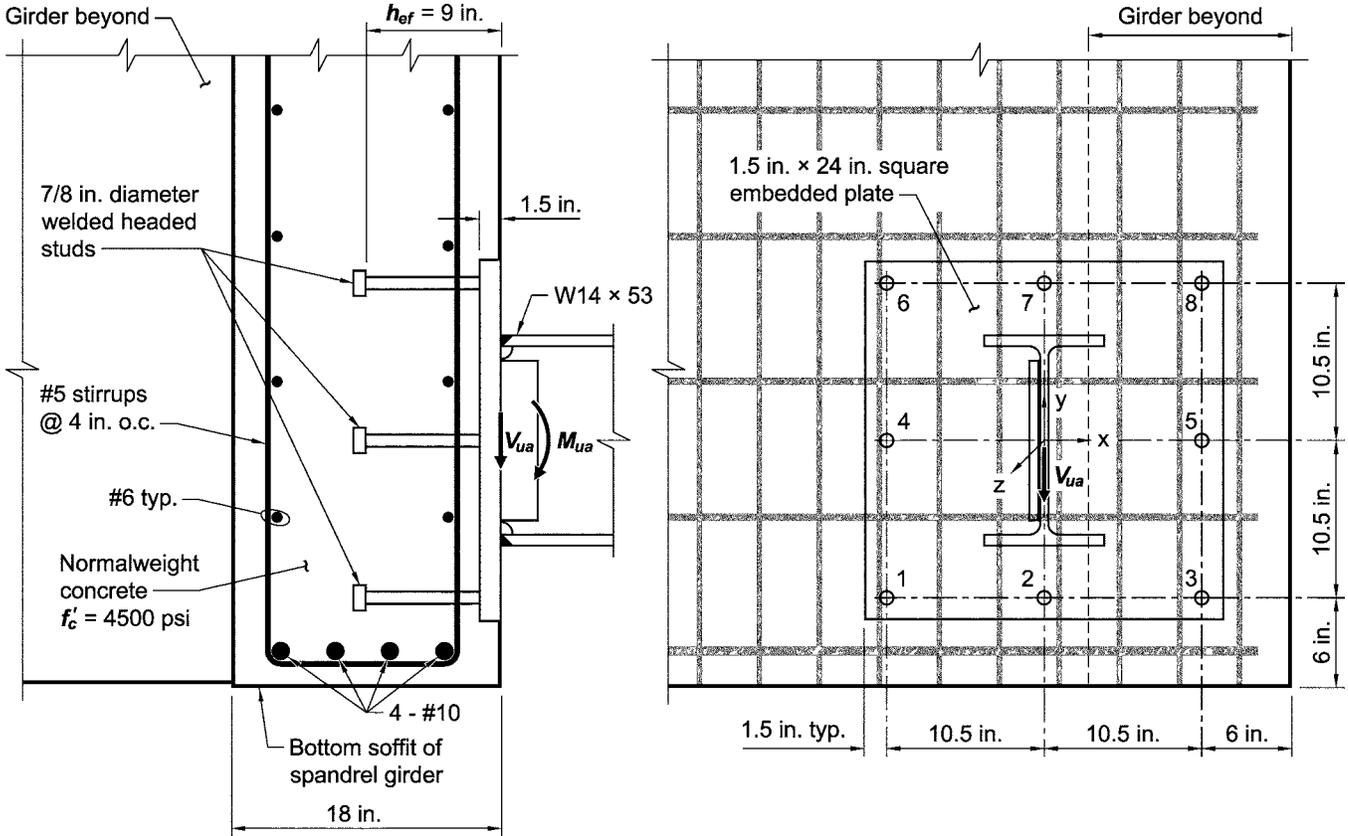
Example 10: Beam support consisting of embedded plate with welded studs.
